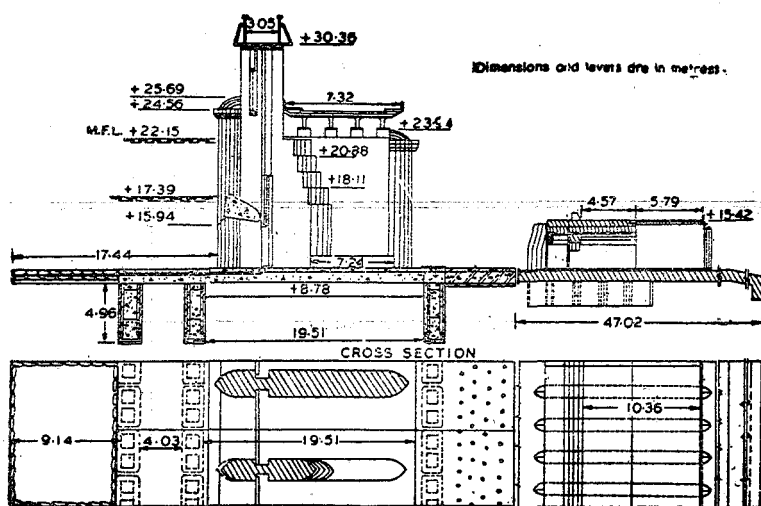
(c) Plan (Sitnagram side) of Prakasm Barrage.
